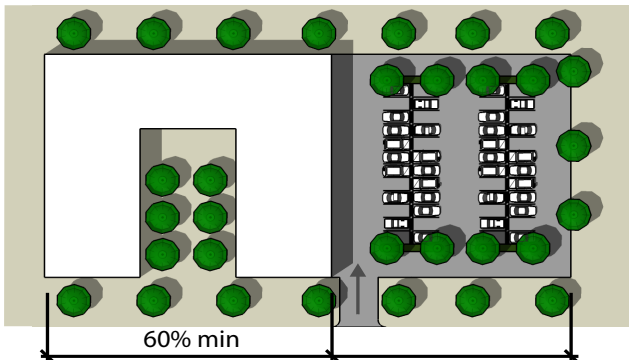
d.1.b.ii. Minimum street frontage for buildings with a central courtyard.
